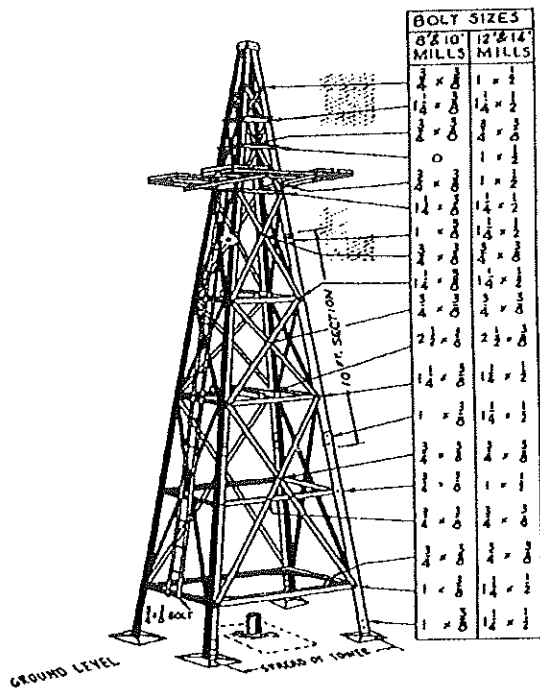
SHOWING CONSTRUCTION OF 30 FT. TOWER AND SIZES OF BOLTS FOR 8/10 FT. AND 12/14 FT. MILLS.
